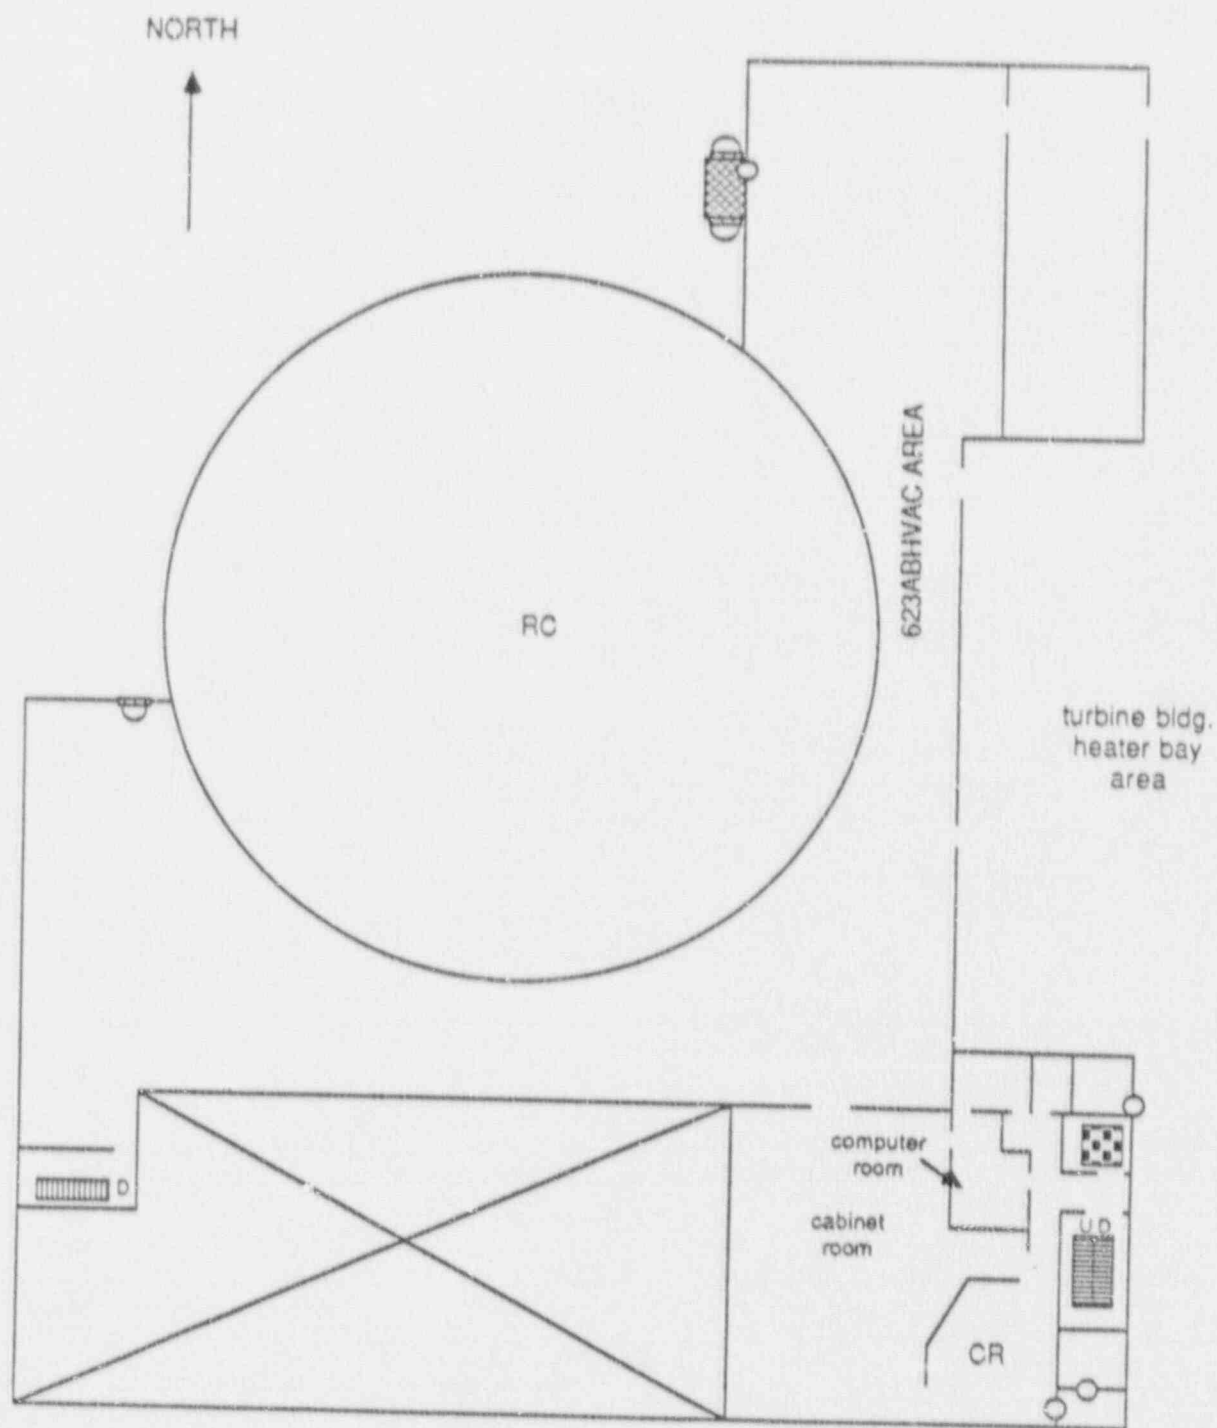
Davis-Besse Containment and Auxillary Buildings, Elevation 623 feet
